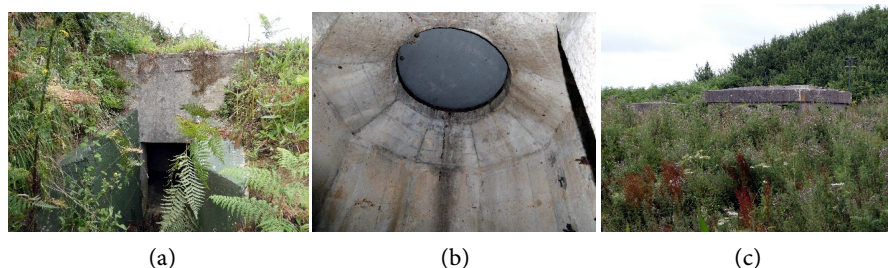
(a) *Tobruck* (1) entrance; (b) Aperture of the combat room; (c) Concrete barracks or ventilation towers (4).
